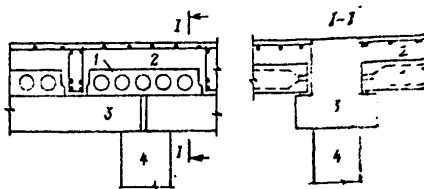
Structural design of the ceiling of structures with the application of standard prefabricated elements.
